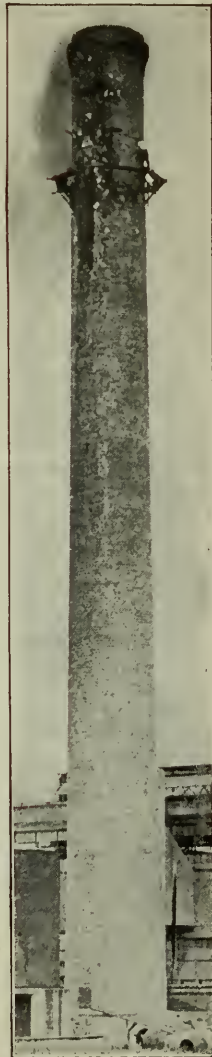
STACK UNDERGOING REPAIR.—NEW BRICK SHOWS EXTENT OF DAMAGE DONE
